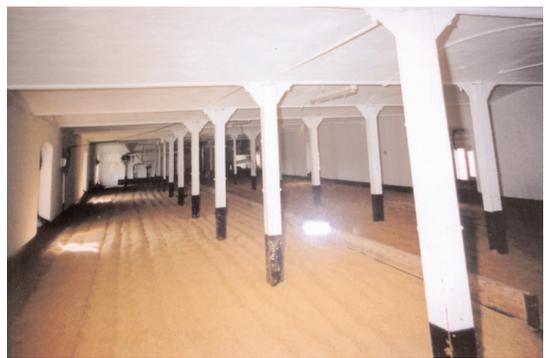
Ditherington 'Little End' germination floor showing iron cruciform pillars supporting roof.
